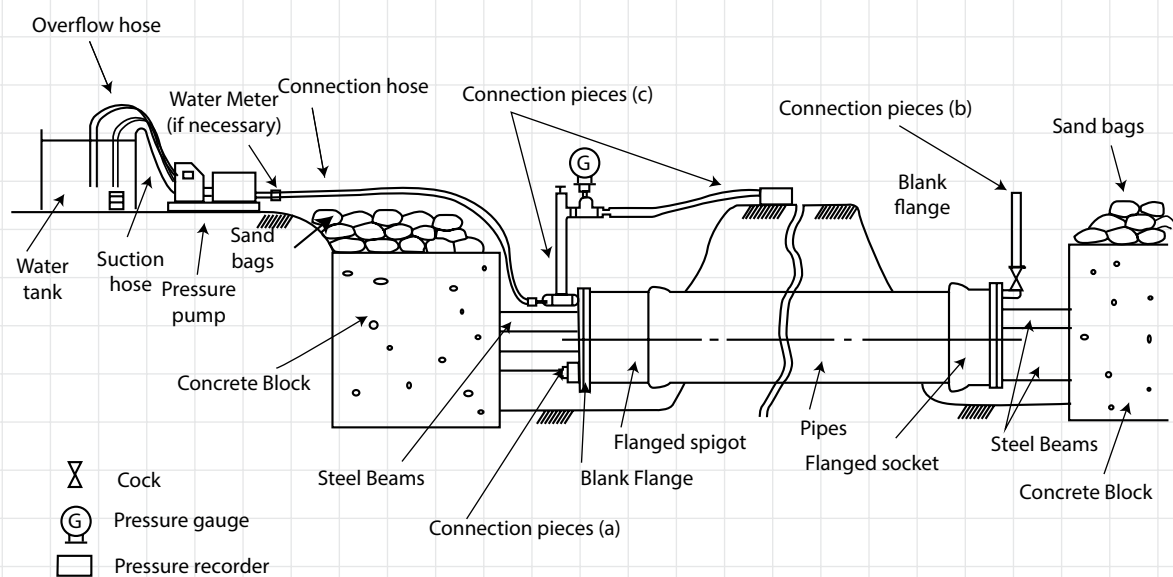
Arrangement for Hydrotesting of Pipe
